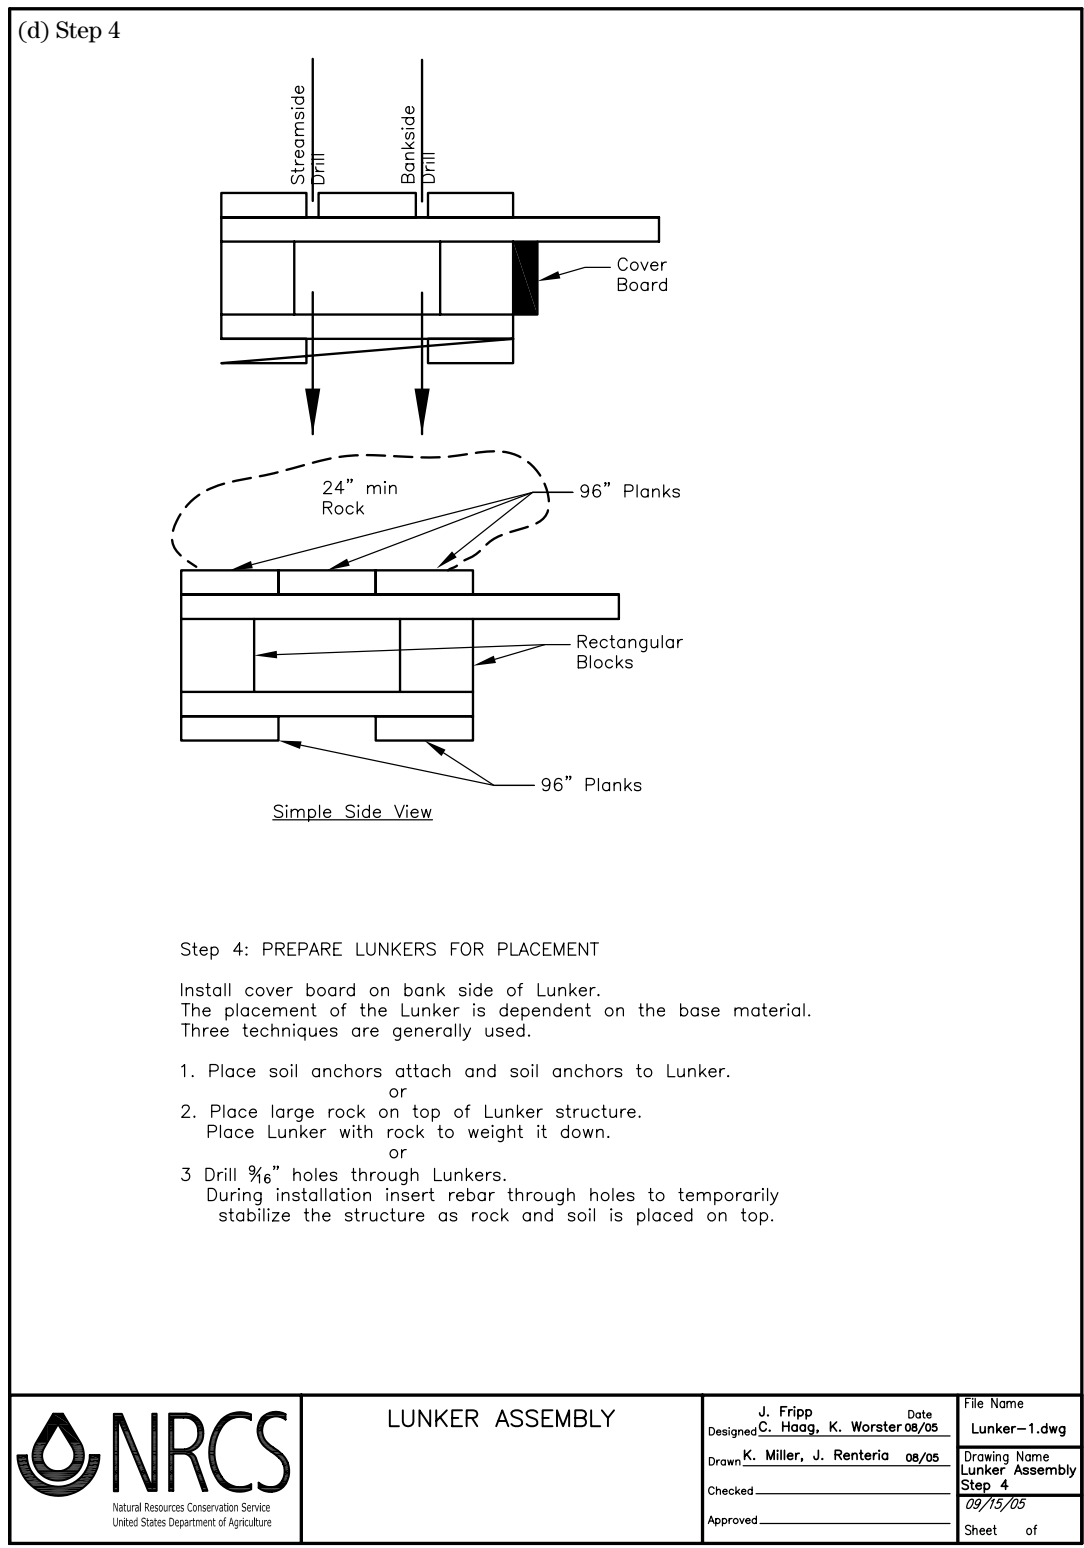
Step 4: LUNKERS construction concept plan—Continued
